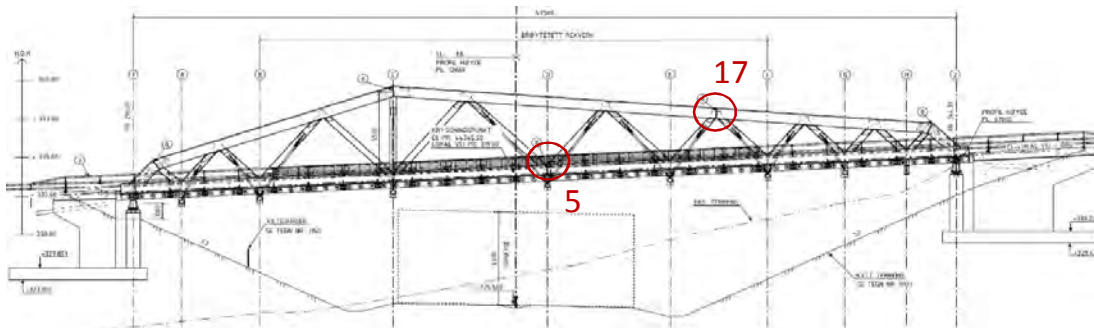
The Perkolo bridge truss – chord splices at joints 5 and 17
